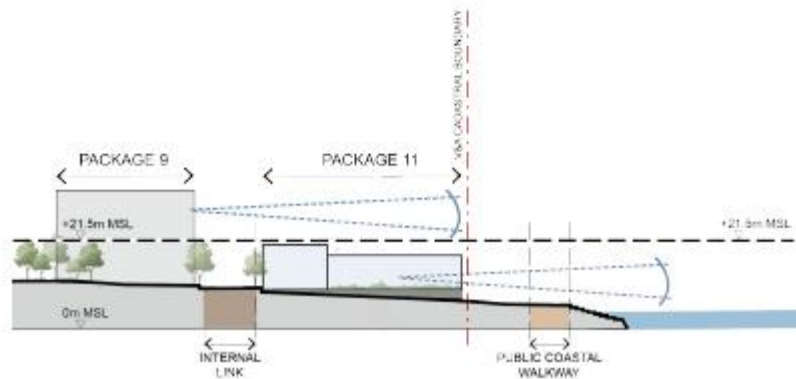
SECTION THROUGH PACKAGE 9 & 11. PACKAGE 9 [NOT LOCATED WITHIN THE ARC OF FIRE] AT A LOWER HEIGHT TO NOT OVERSHADOW PACKAGE 11 WHICH IS LOCATED IN THE ARC OF FIRE
